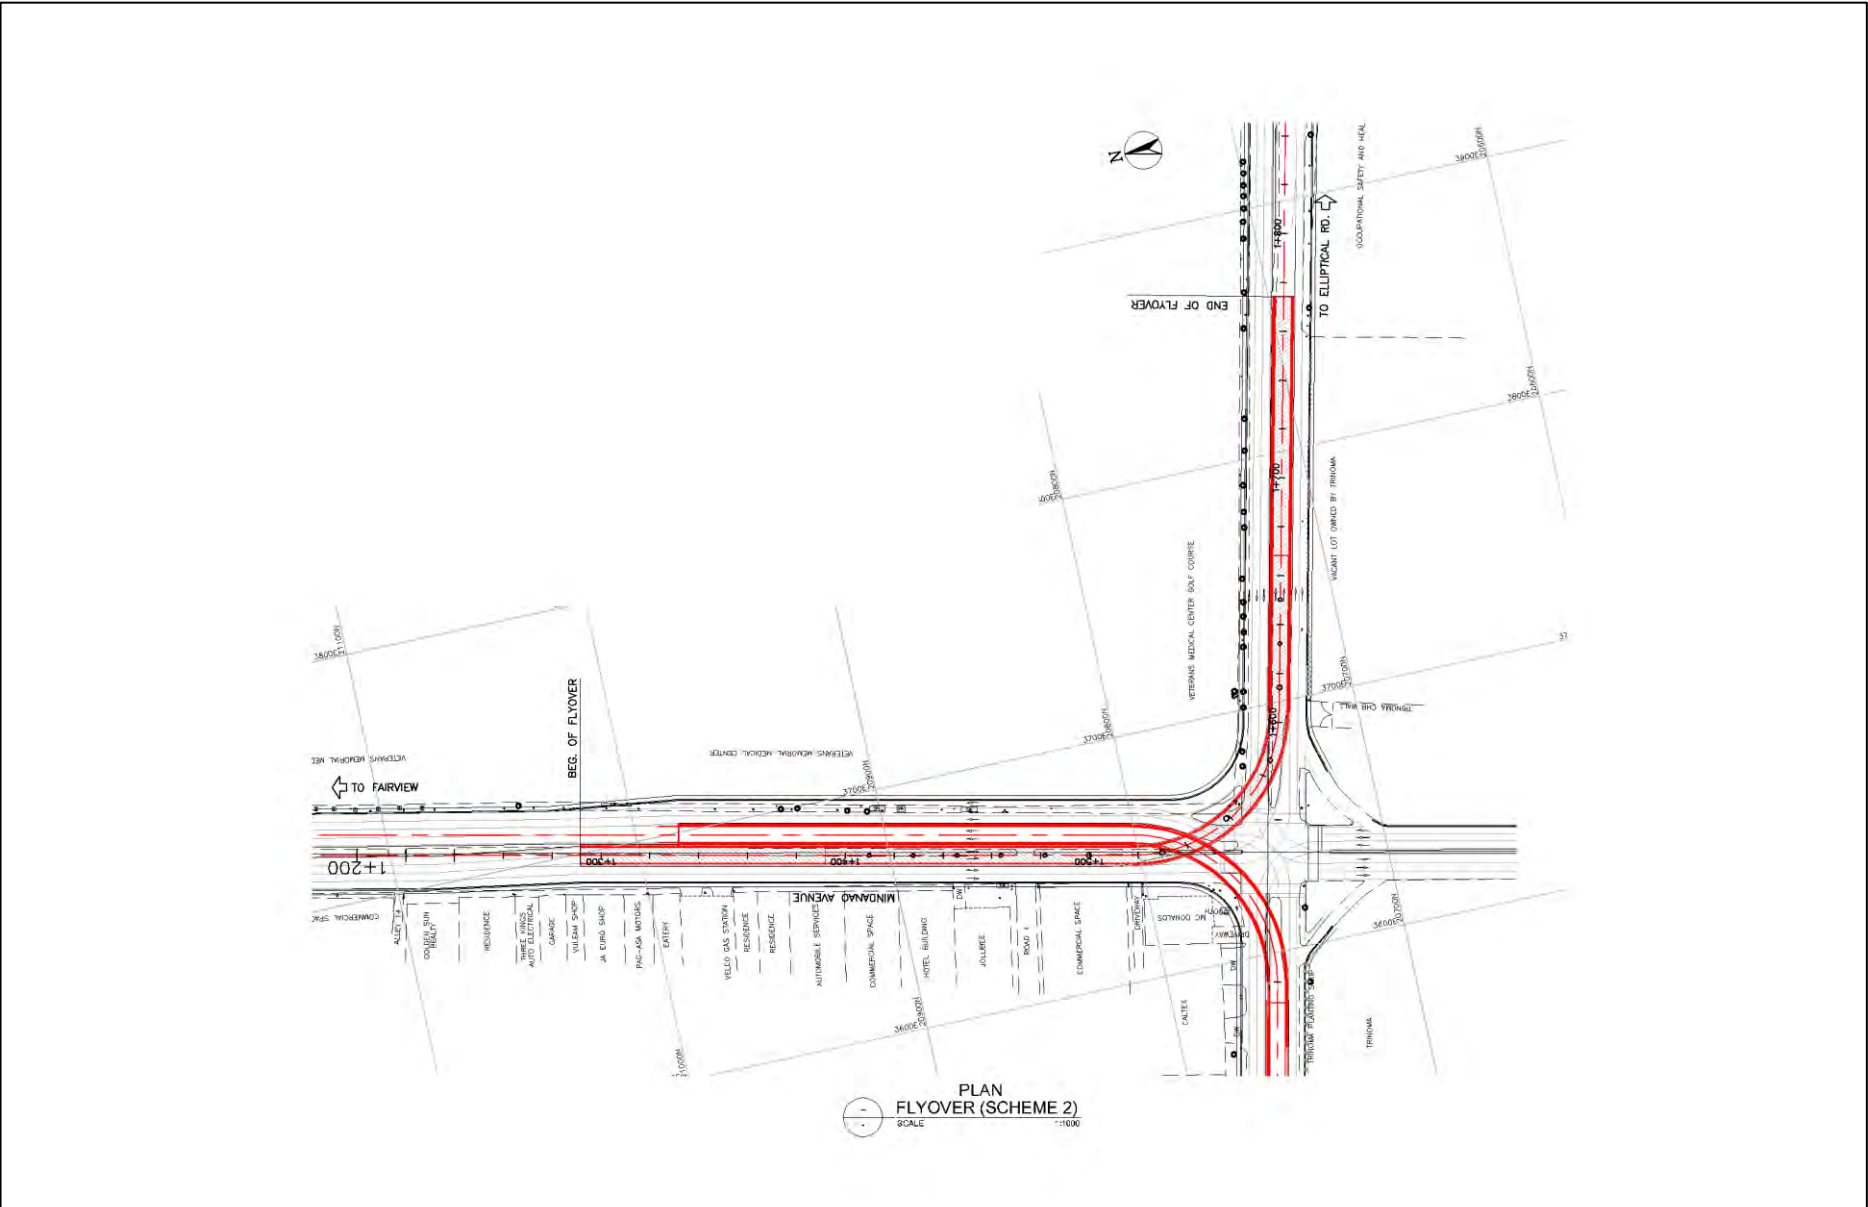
Plan and Profile of Flyover (North/Mindanao Ave.)
